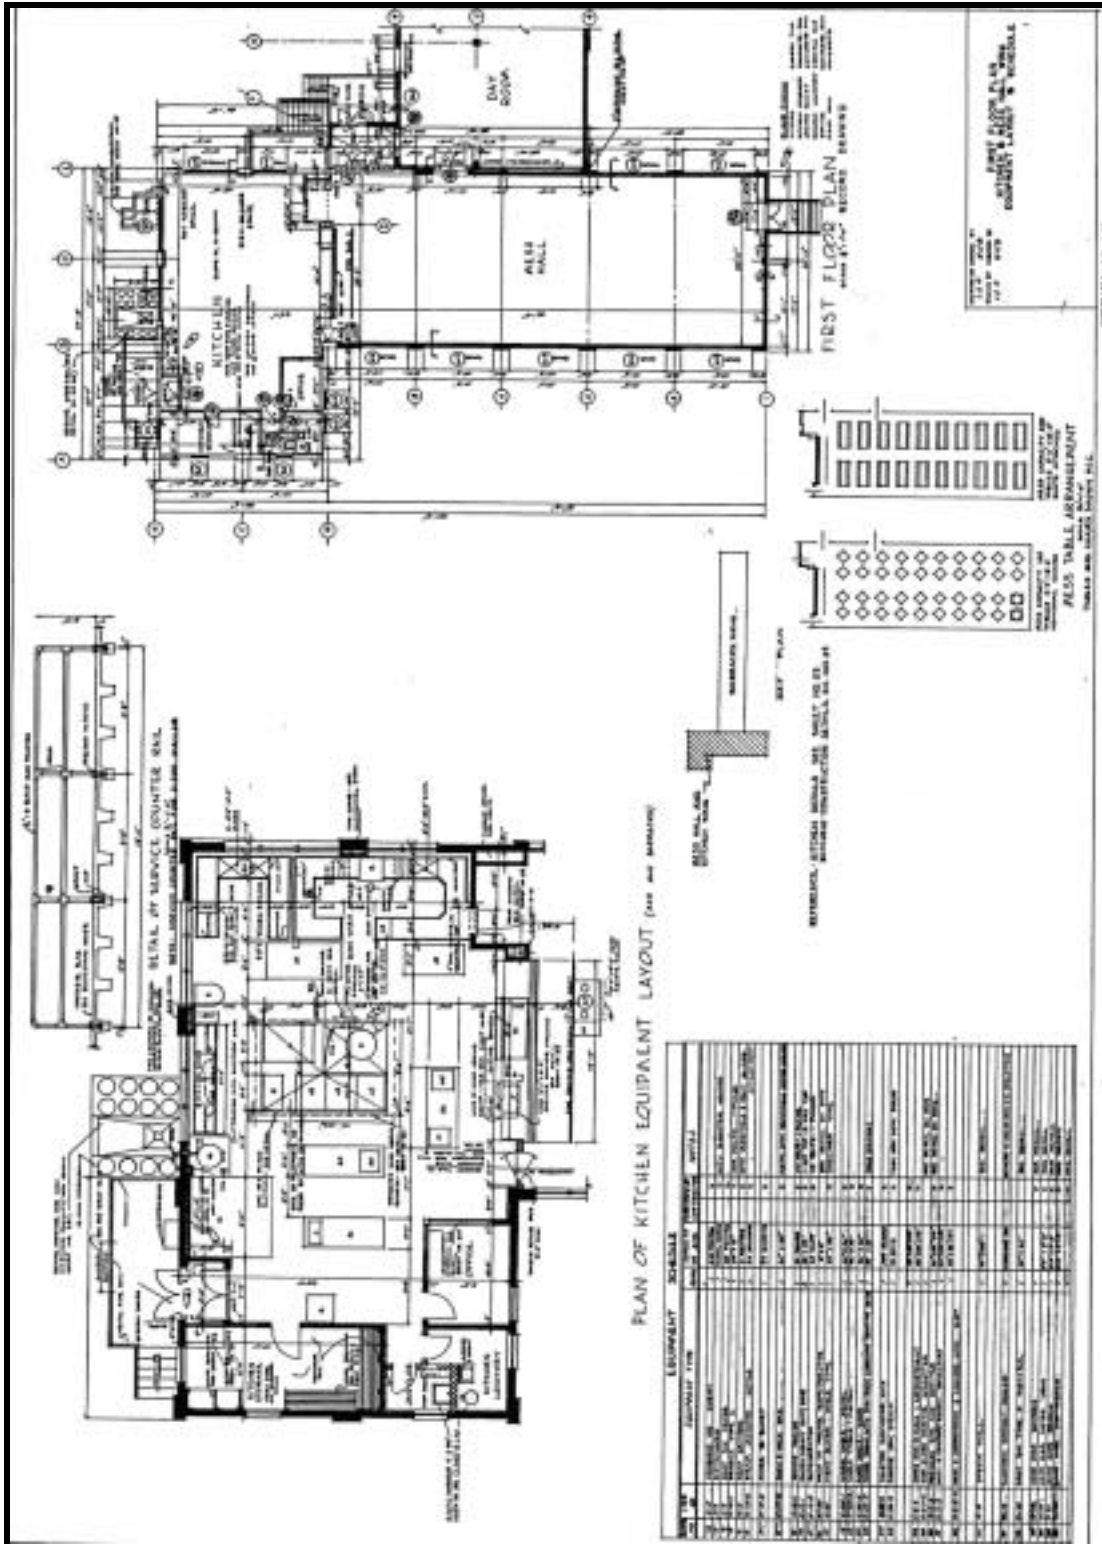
225-man hammerhead barracks, floor plan, kitchen and mess hall wing (ca. 1951) (Engineering, Ft. Benning).
